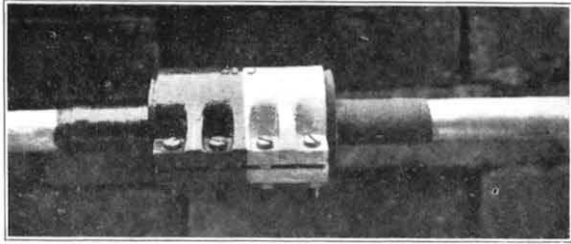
GAP COMPLETED WITH METAL COUPLING.
